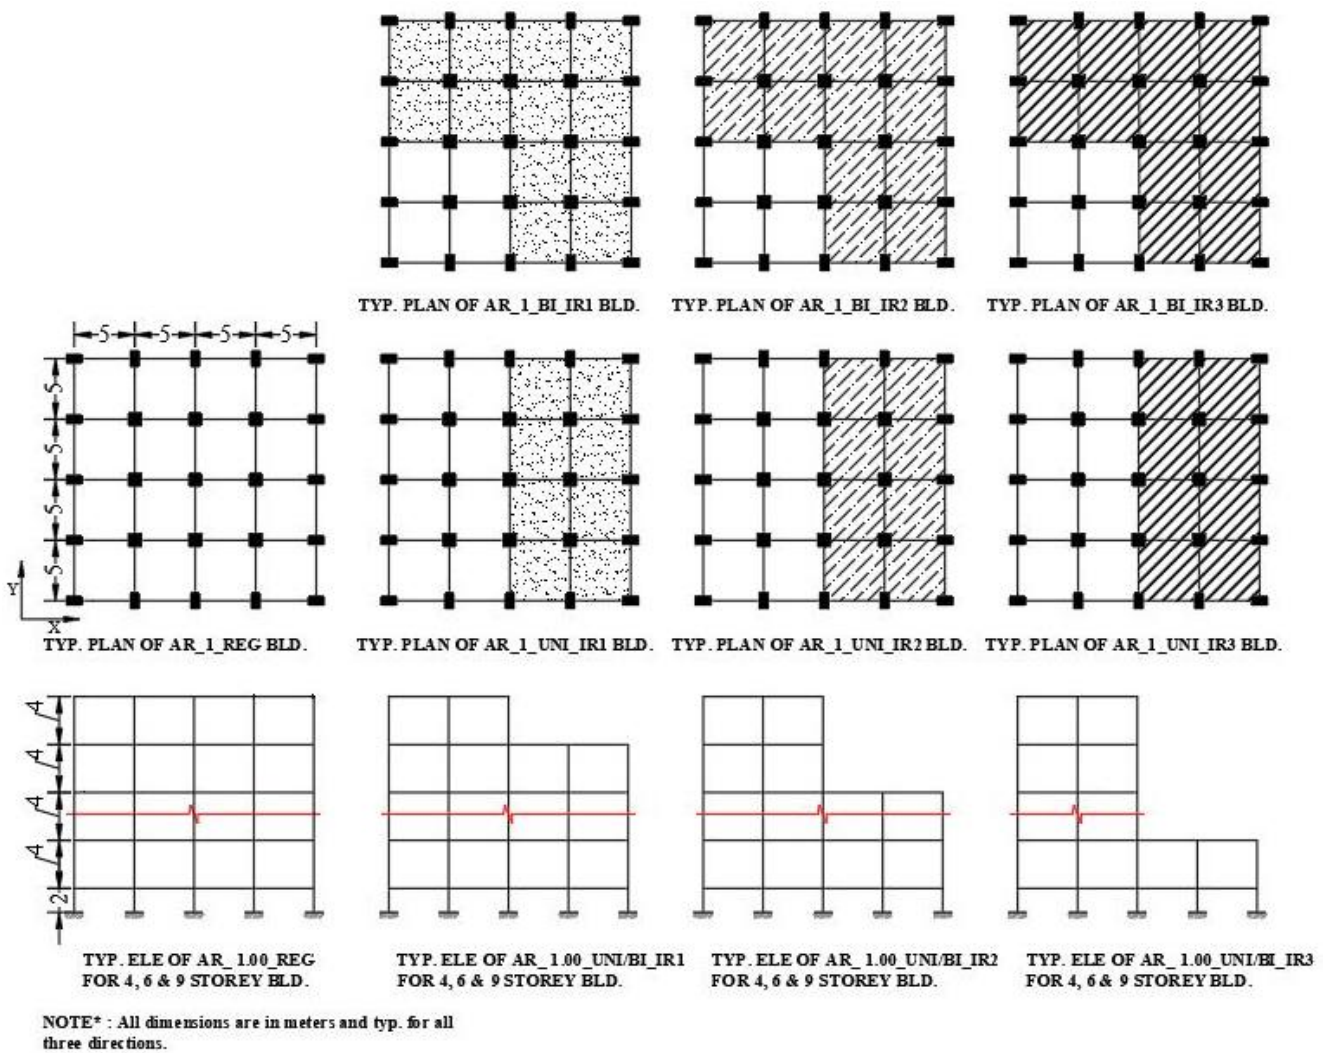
plans and elevations of 4, 6, and 9 storey regular and irregular buildings
